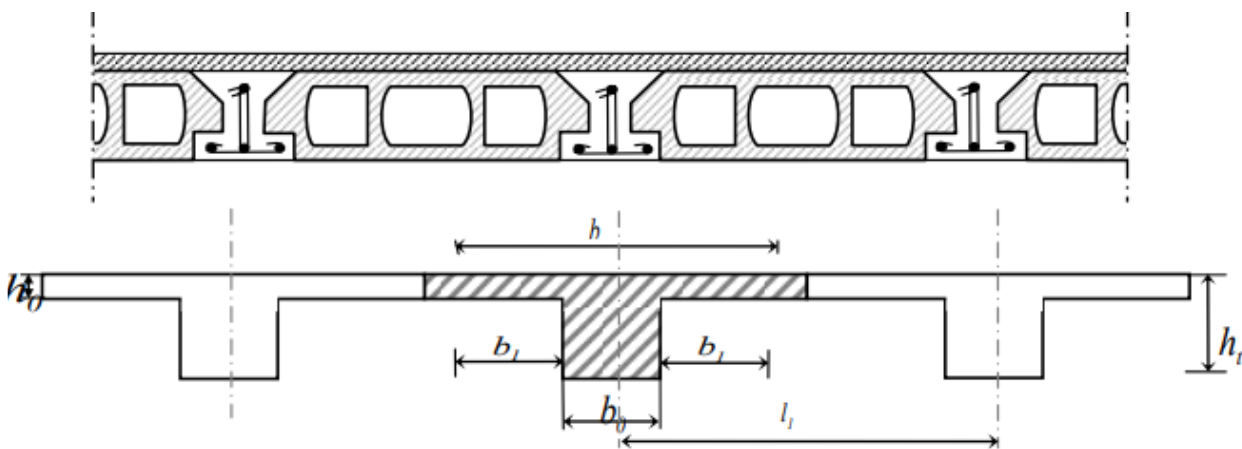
Cross-section of a hollow core floor slab (CBA93)
